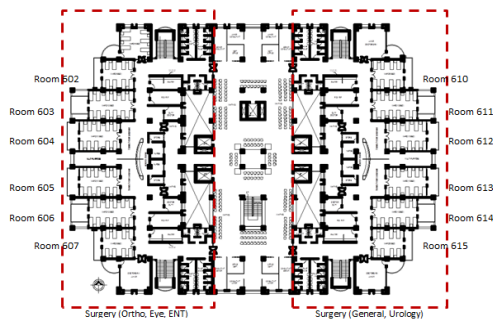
6th Floor Plan (Surgery wards-1&2)
